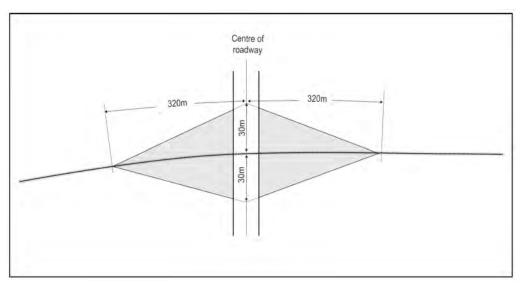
Approach site triangles for rail level crossings with "Stop" or "Give Way" signs.
